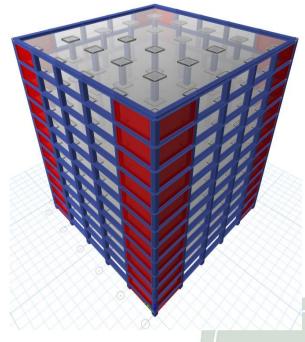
3D model of flat slab with both edge beam & shear wall.
